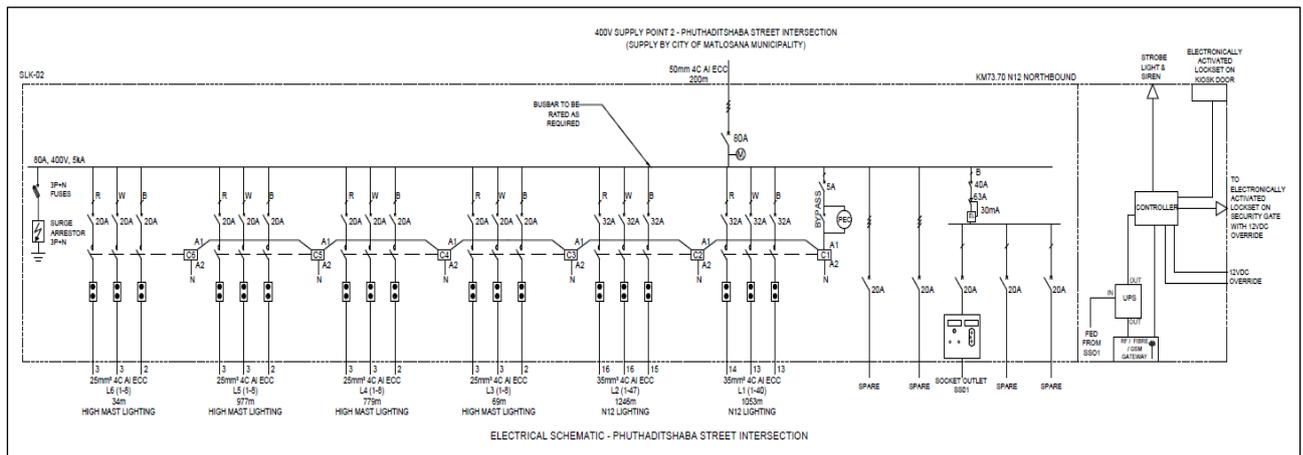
SLK-02 – Phuthaditshaba Street Intersection Kiosk
